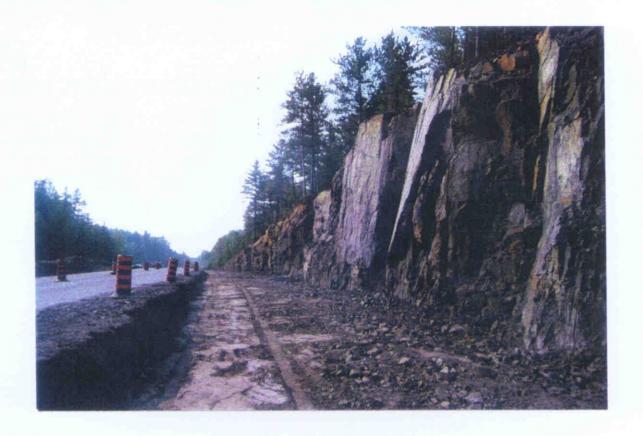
(Above) Sized (minus 10 cm) traprock product used as shoulder or possibly pavement base.
